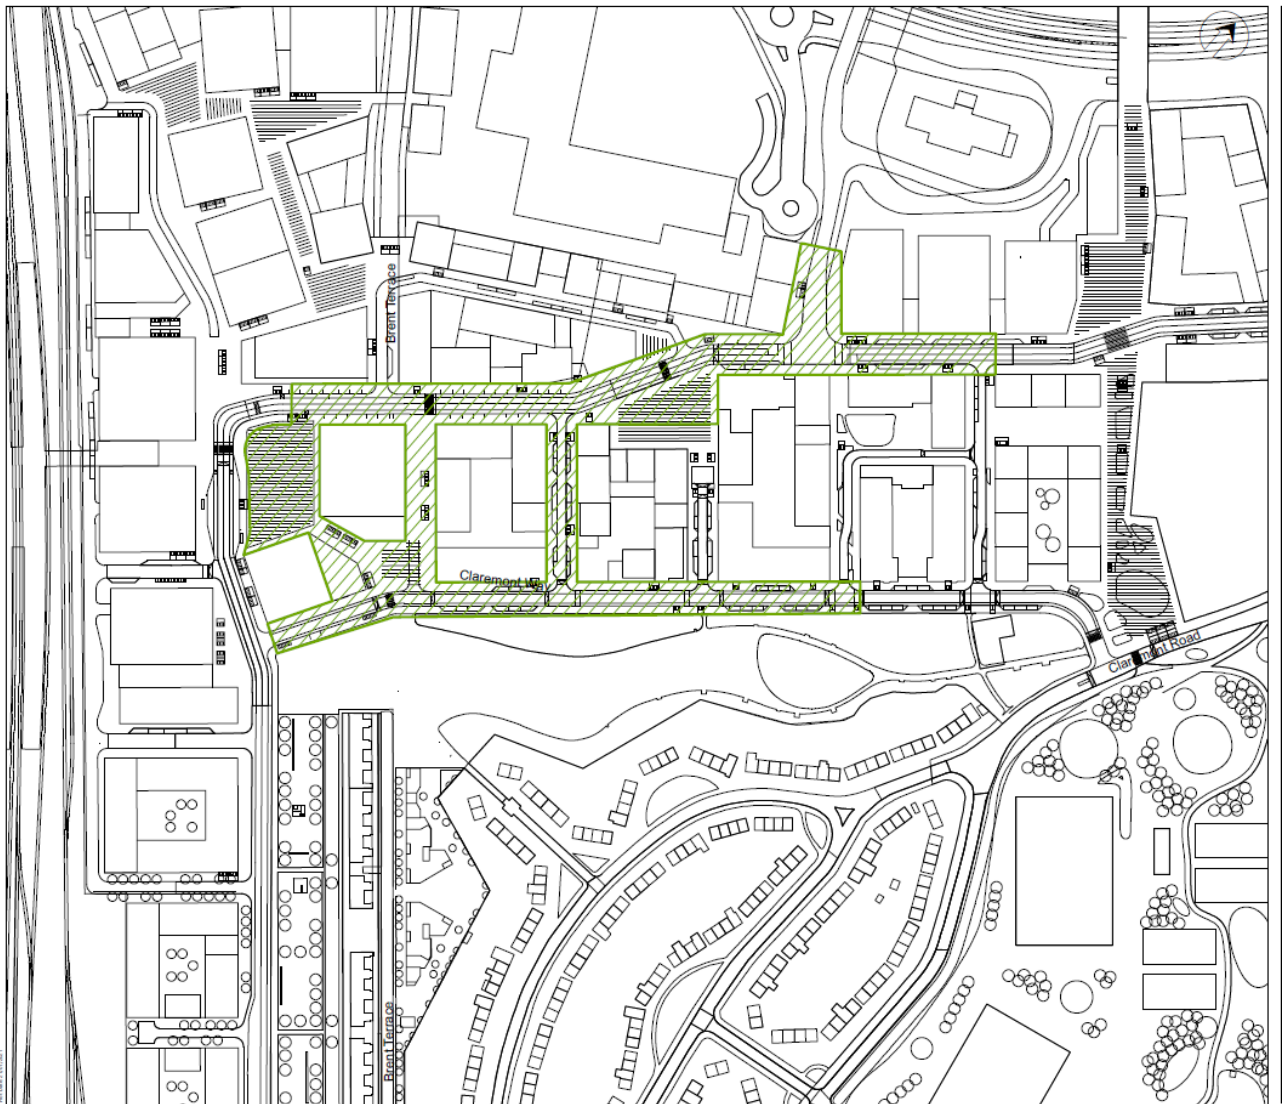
Site boundary storage of waste [AR2, AR4]
